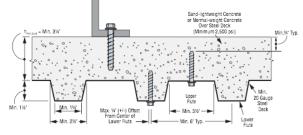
Installation of %" Diameter Anchors in the Topside and ¼" Diameter Anchors in the Soffit of Concrete over Metal Deck
